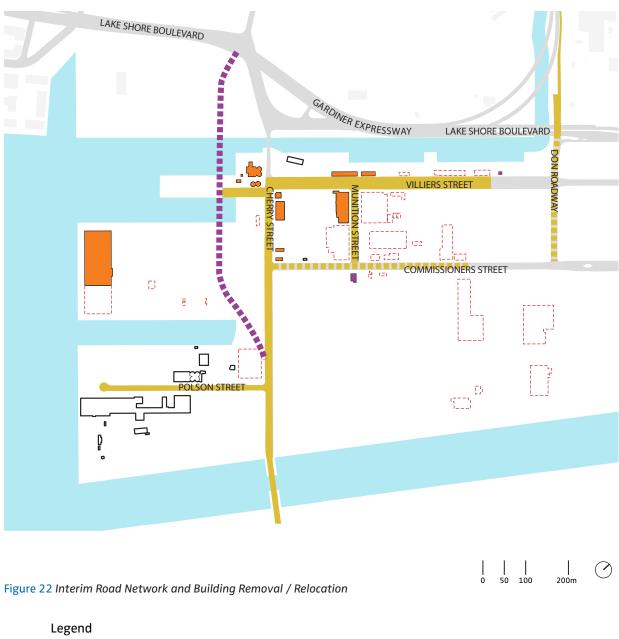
provides a comprehensive plan of buildings to be demolished or relocated during the construction of the Project. It also outlines the interim road access to be provided during construction and before the redevelopment of the Villiers Island and Polson Quay Precincts.
